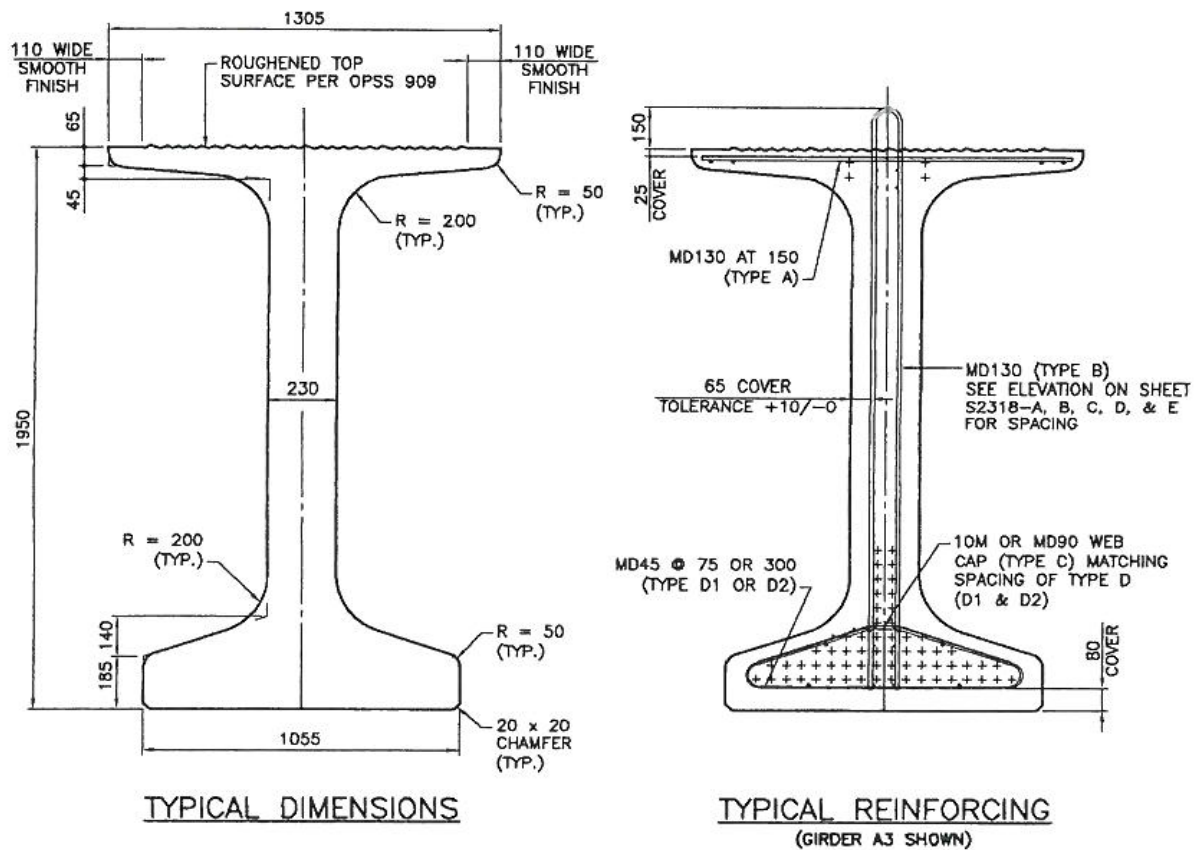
Typical dimensions and typical reinforcement of a girder from tunnel T3 (from PIC soft version: Technical\Drawing and Calcs\E-Construct\_IFC\_Drawings- TAB-3 Drawings)
